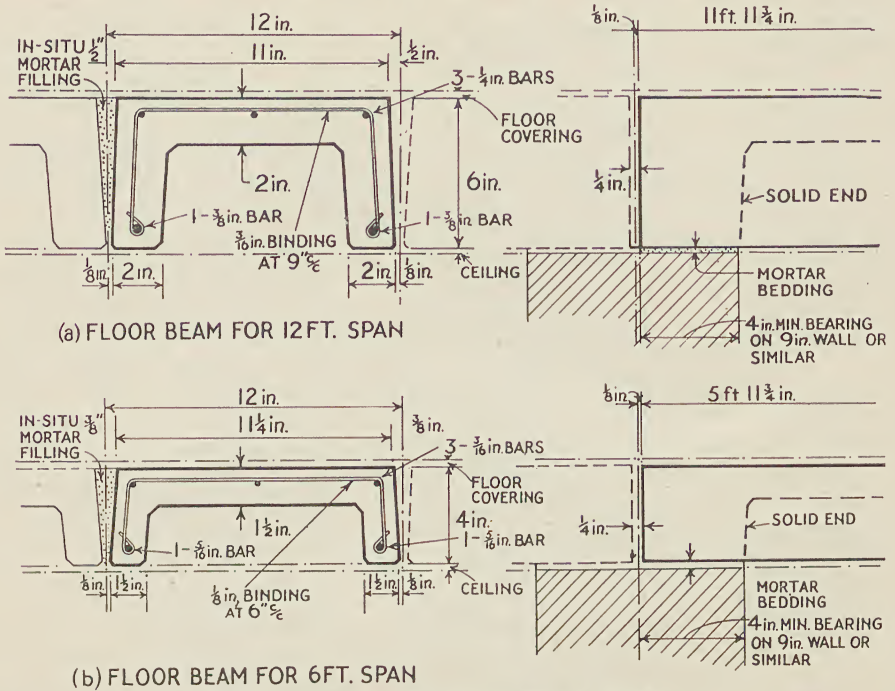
PRECAST CONCRETE FLOOR BEAMS.
